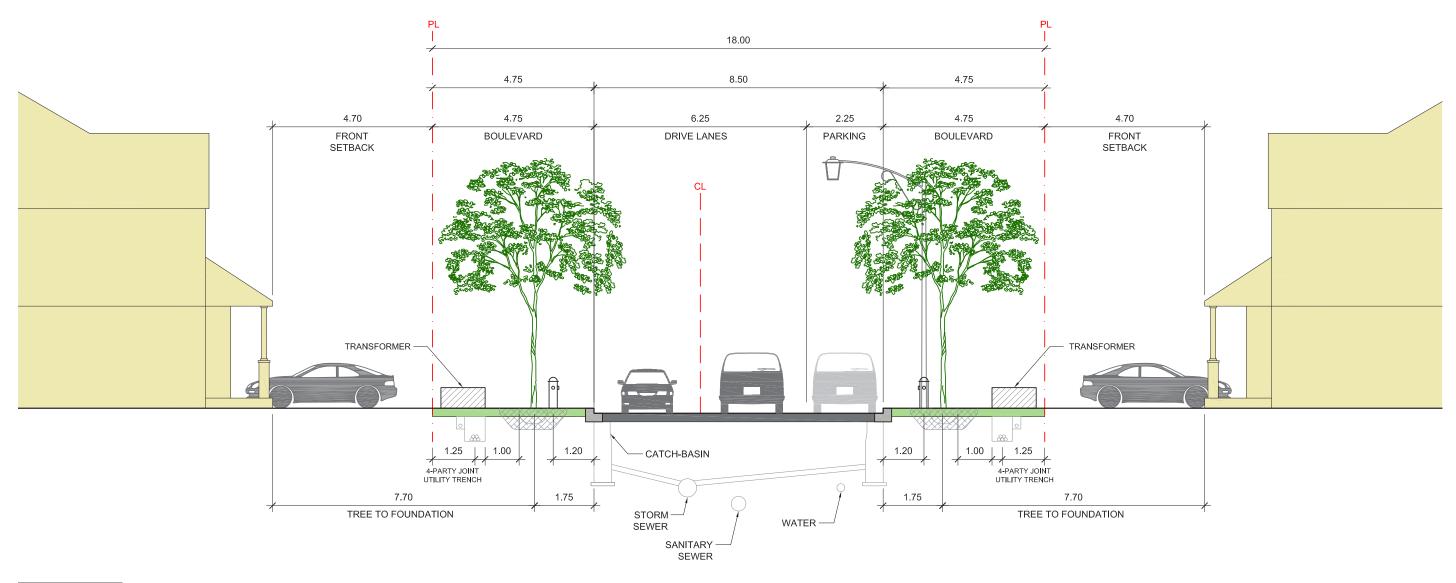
Local Road (Typical 18.0m ROW - Area 1)
